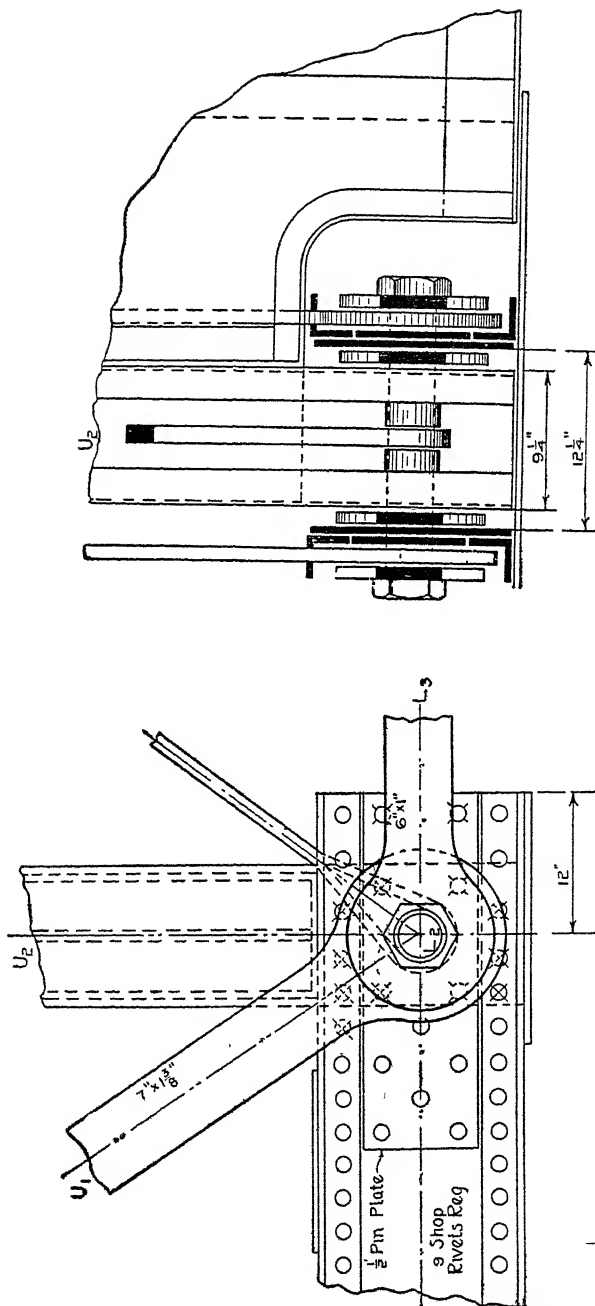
Side Elevation and Transverse Section Showing General Details of Construction at Panel Point in Lower Chord.
